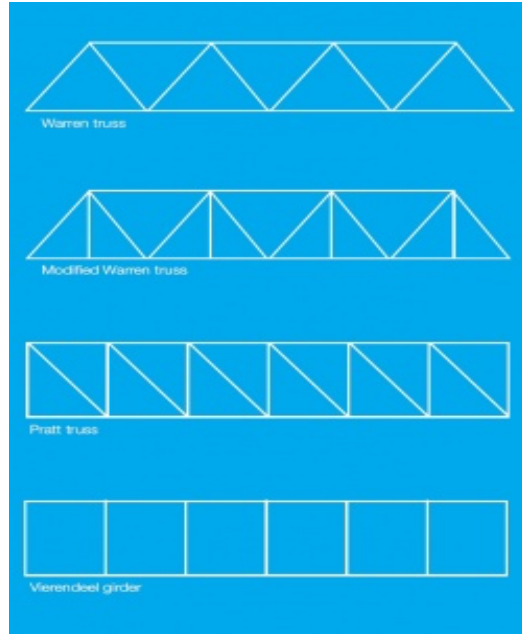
Commonly used Trussing Profiles. Several geometries of trussing are used in different structures. The most basic of these arrangements is the Warren Truss (first) with room for added verticals as in the Modified Warren Truss (second) (Types of Truss and Vierendeel Girder, from (“Design of Steel Footbridges”, n.d.)).
